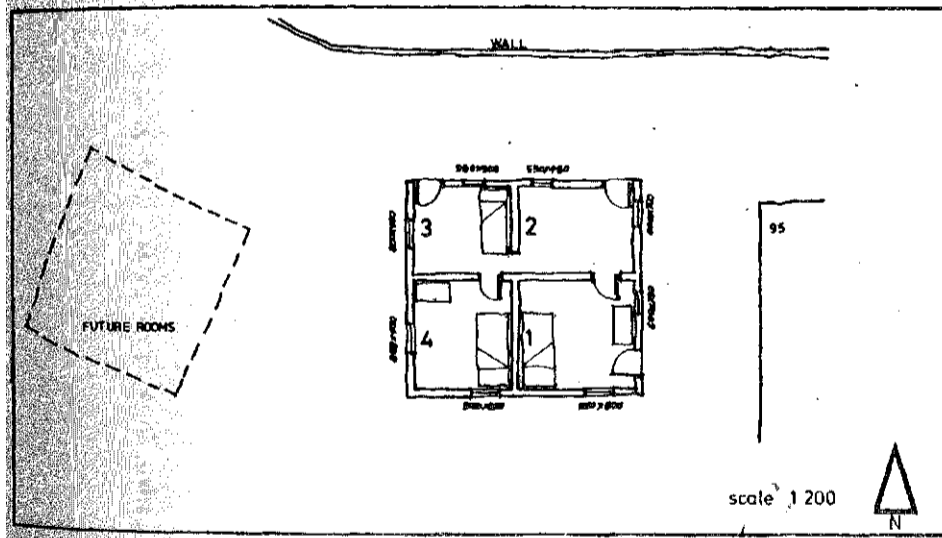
COMPACT DWELLING WITH EXTERNAL AND INTERNAL DOOR ACCESS
